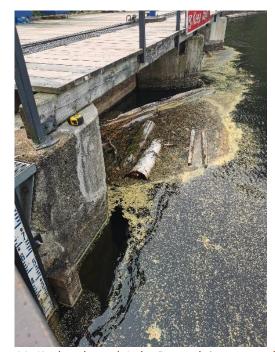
Kashwakamak Lake Dam, sluiceway and deck, detail.
